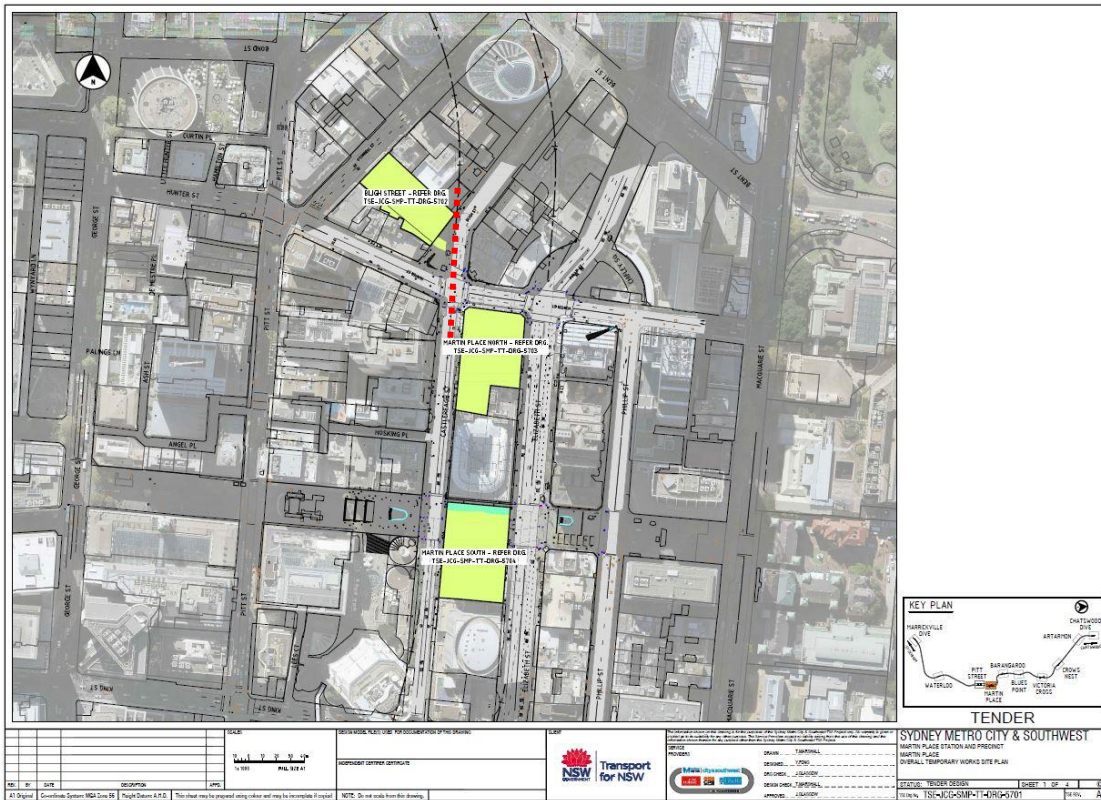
Martin Place Station: Overall Temporary Works Site Plan. The relevant section of the Bennelong SWC is indicated in red
